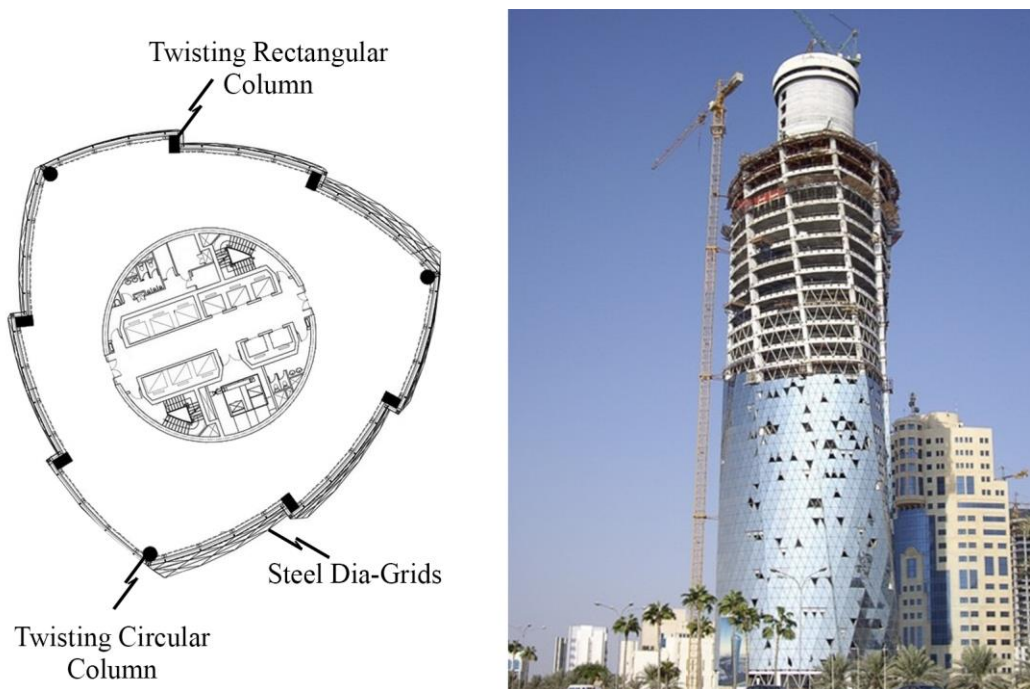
Al Bidda Tower; second floor plan (on left) (Architectural, 2011) and site photo (on right) (Safetravels196, 2018)
